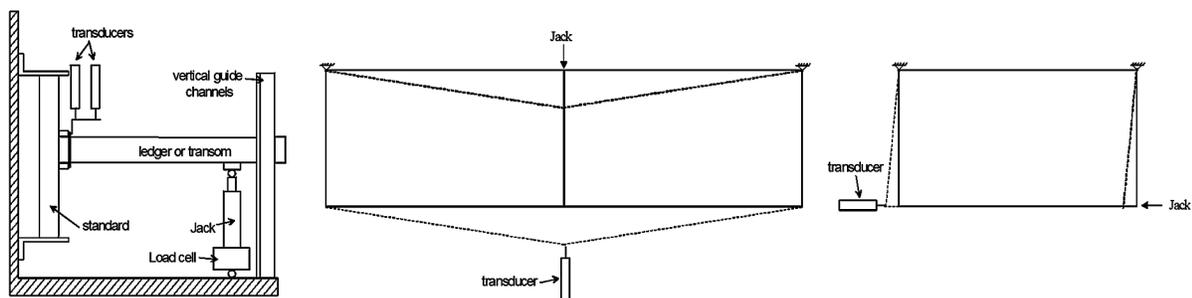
(a) shows that in order to get the most accurate results the horizontal member is restrained from rotating by a pair of guide columns situated beyond the jack. In addition, to avoid errors due to shear or beam deflections in the horizontal member (see Abdel-Jaber, Beale, & Godley (2006)) the rotation of the connection is measured using two transducers placed on a small lever placed adjacent to the connection. The European standard BS EN 12811-3 (BSI, 2002) requires initial pilot tests monotonically loaded directly to failure in both positive and negative directions to obtain an estimate of the ultimate moment capacity. This is then followed by a series of tests cycled between
